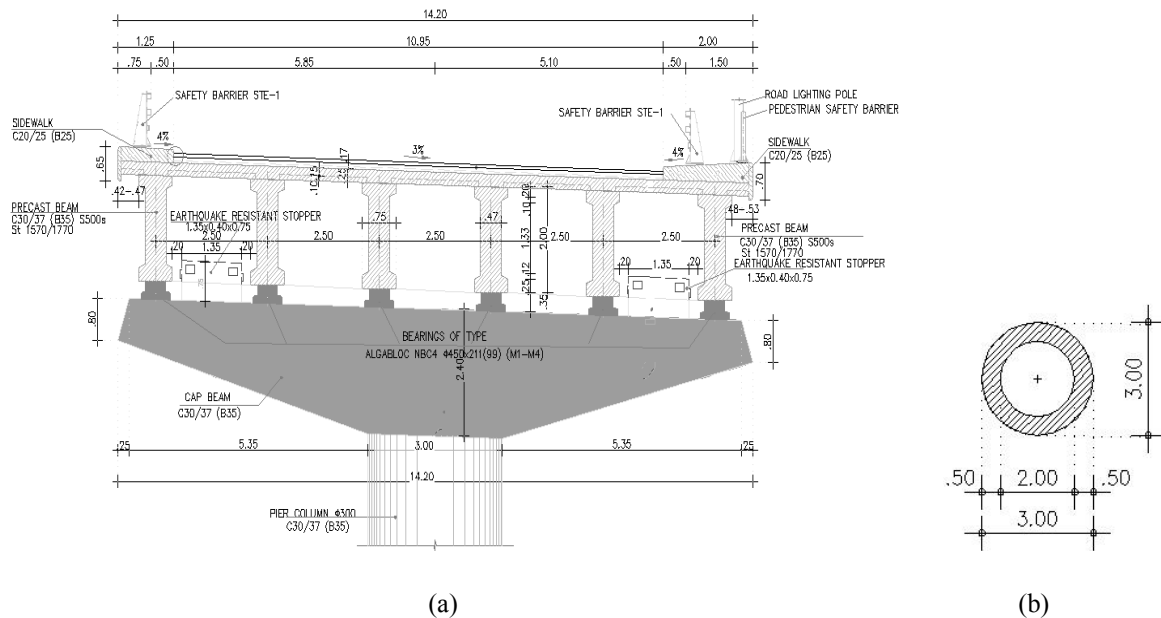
(a) Bridge typical support section. (b) Pier cross section.
